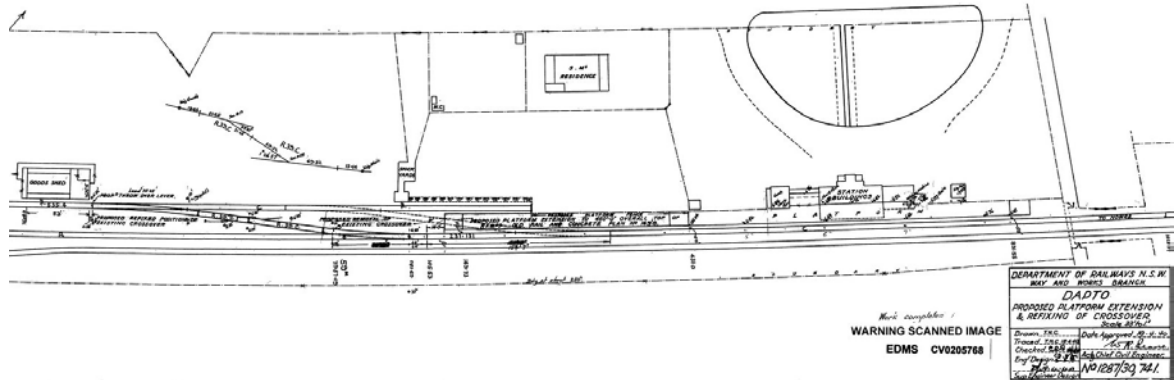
Detail of schematic plan of Dapto railway station and yard, 1940, showing the semi-circular layout of the park between the platform building and Station Street (Source: RailCorp Plan Room, 0205768).
